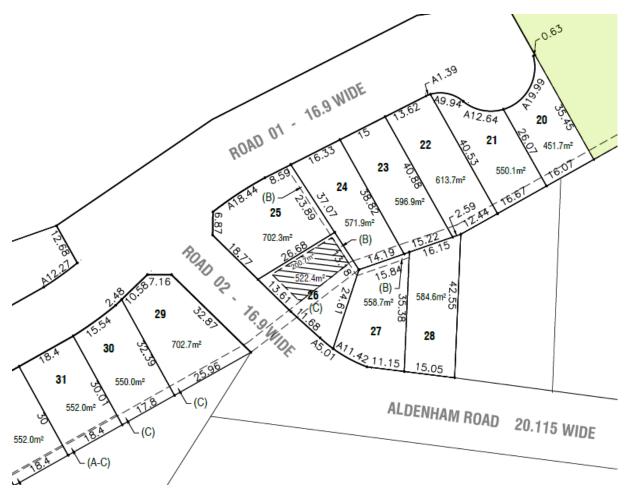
Proposed Subdivision Plan – Revision F – Lot 26 adjusted Sewer Easement Location and Building Envelope
